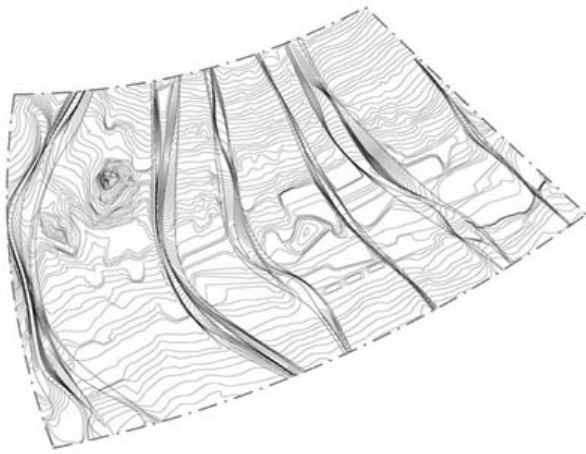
Diagram of the water drainage system. Figure 5. Site plan.
